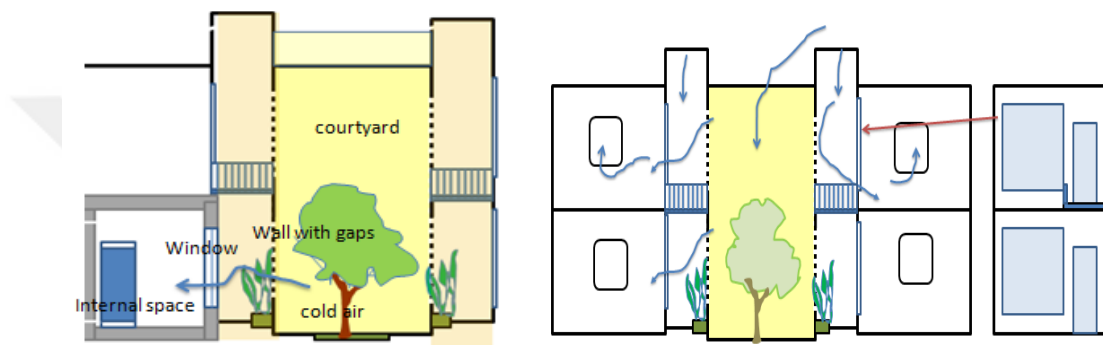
Cooling Solutions; the cold air enters the interior space through gaps on walls then the glass windows, which located behind the walls
